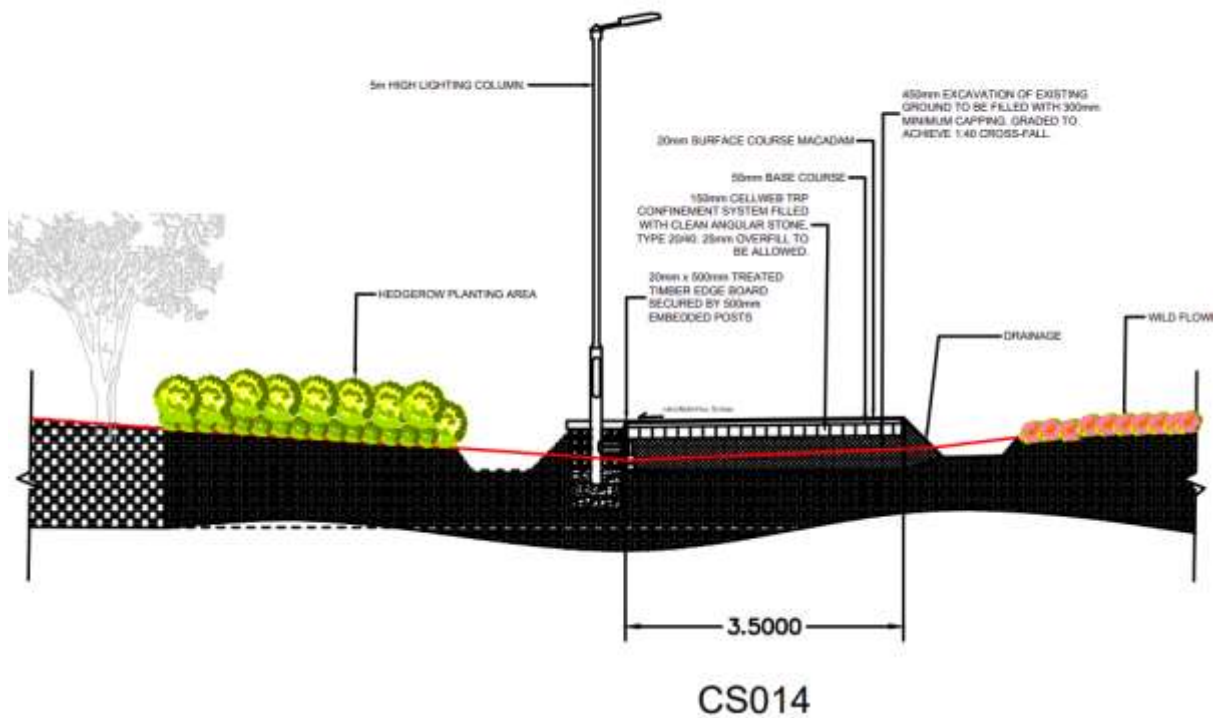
Cross Section 014 along proposed Greenway south of the Fisherman Cottages
